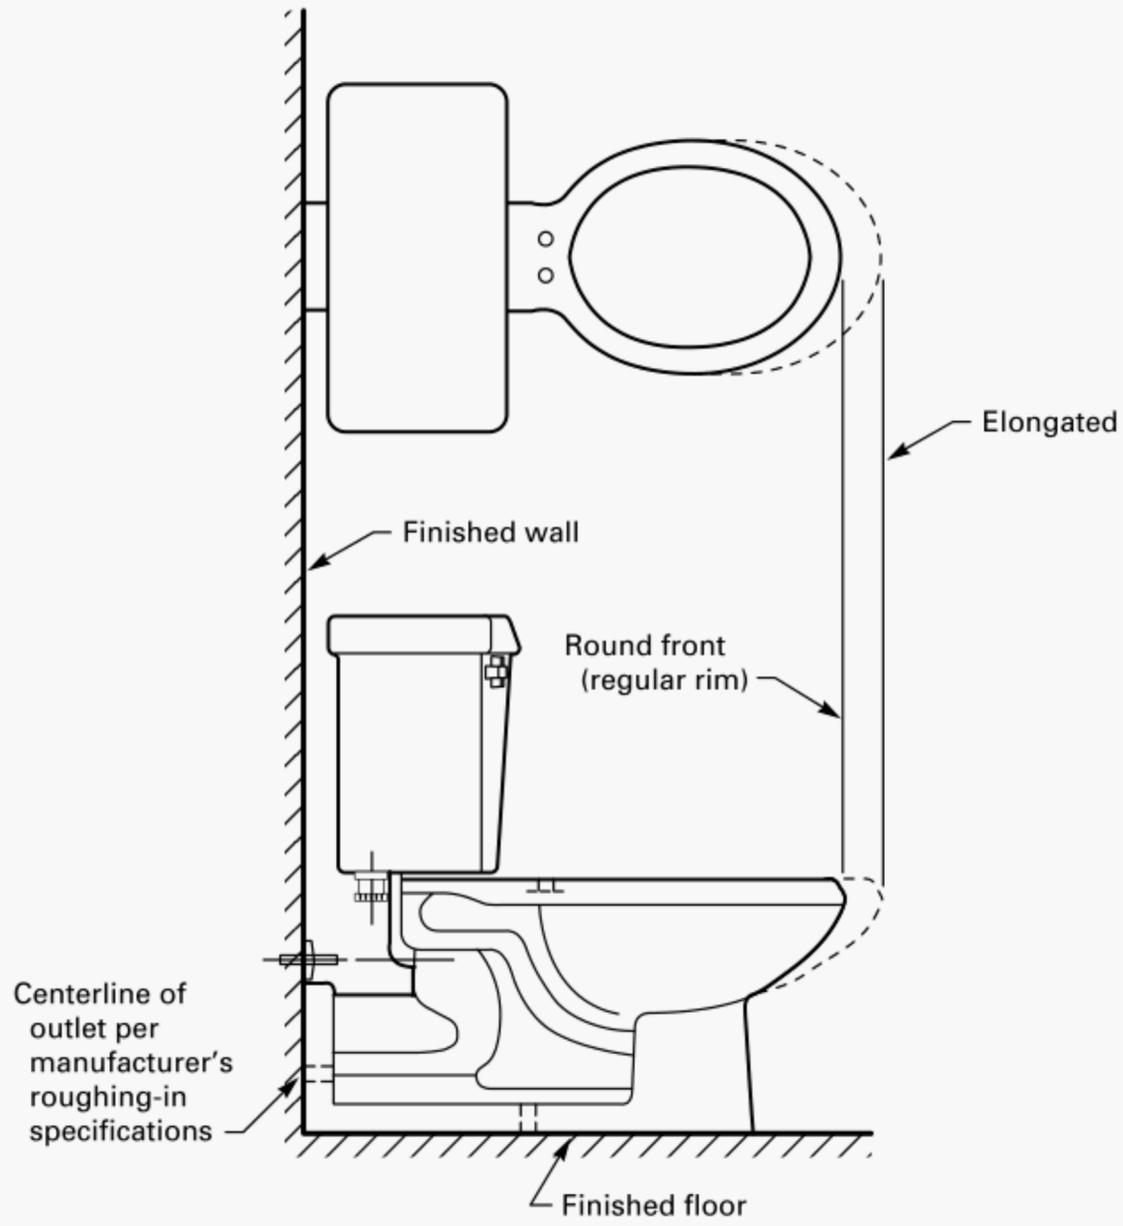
Close-Coupled Water Closet, Floor Mounted, Back Outlet
